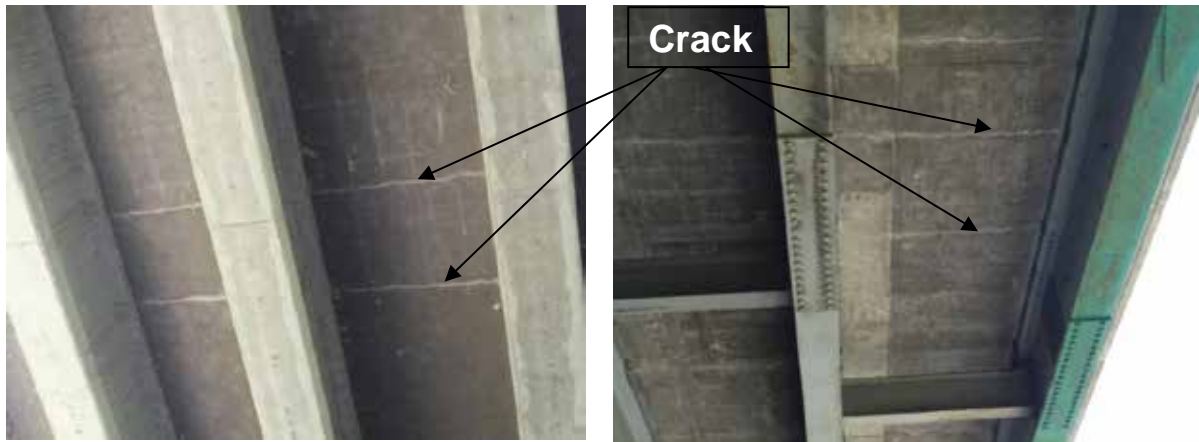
Transverse cracking in concrete bridge (left), and steel girder bridge (right).
